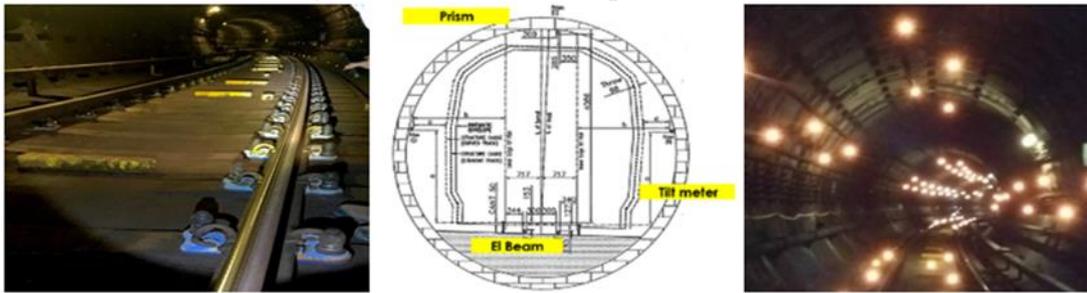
From left to right: Reinstated track bed, instrumentation details of live tunnel and prism layout
